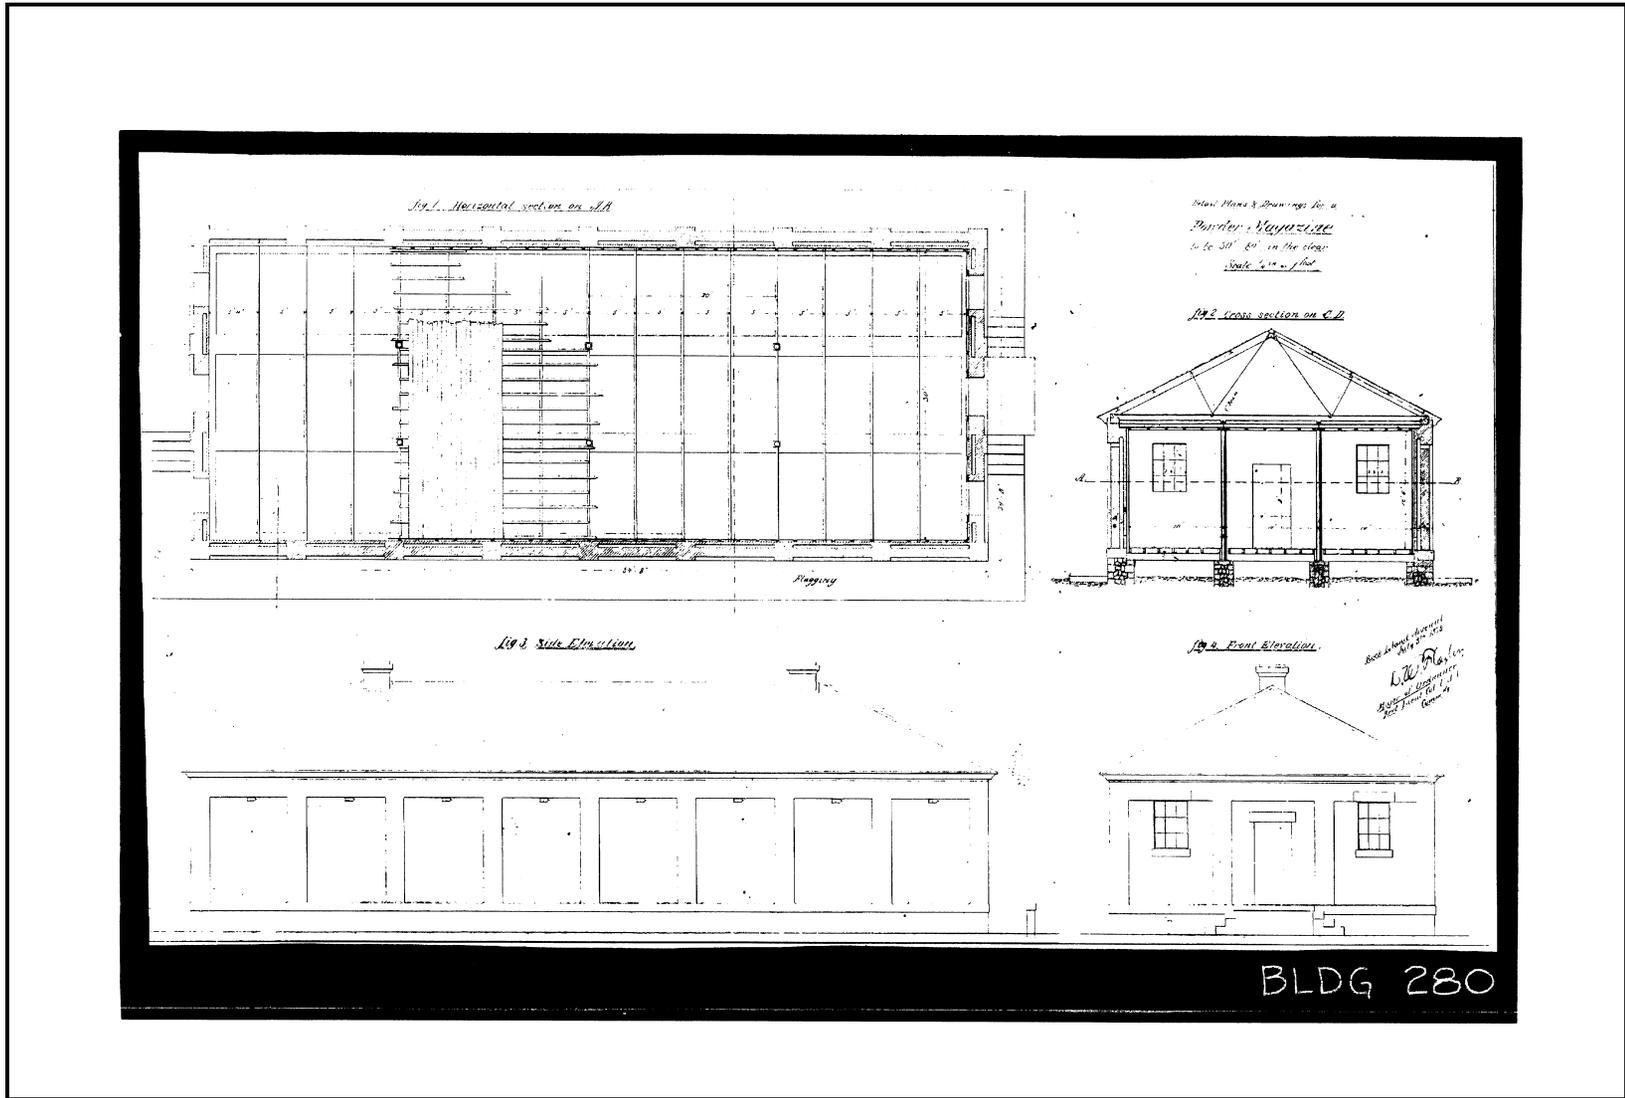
Detail plans and drawing for Powder Magazine (Building 280) at Rock Island Ordnance Center.
